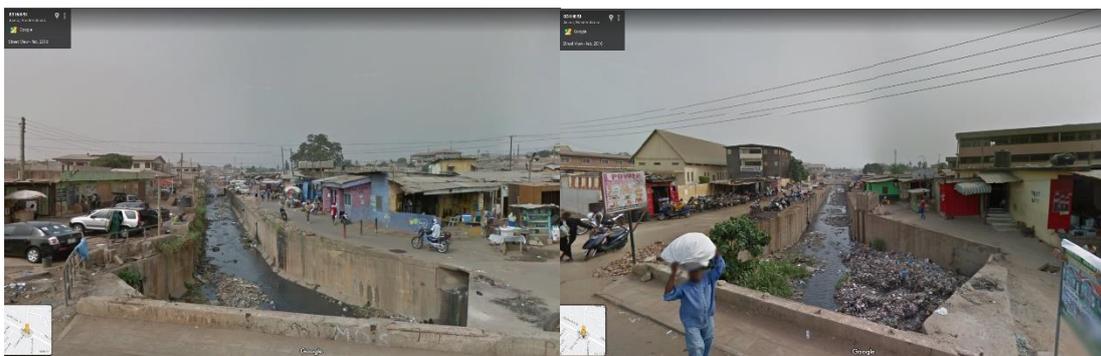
Nima drain at Hill Street (850 m upstream from Ring Road Central) (left: looking downstream, right: looking upstream)
